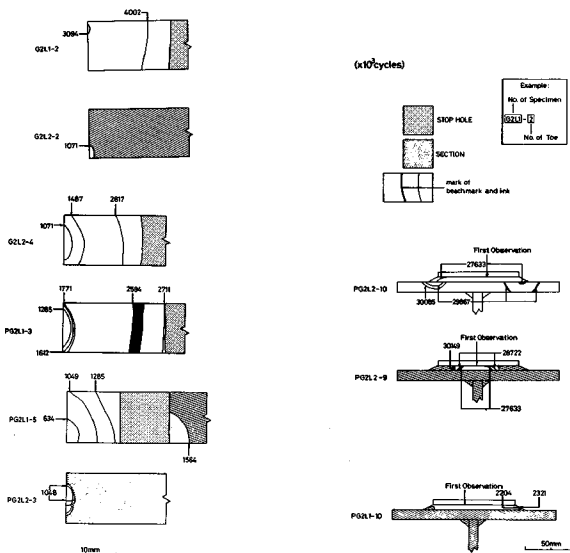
Sketch of Fatigue Fracture Surface at End of Gusset.
